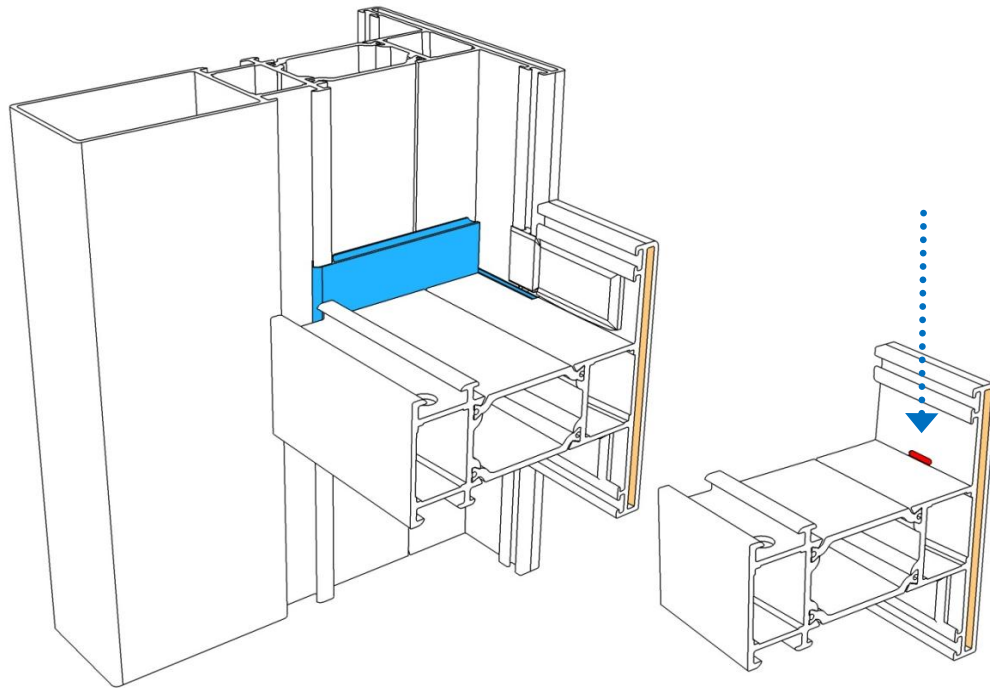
Any water that does penetrate is drained back to the outside through slots (red) which are connected to the exterior channel(orange).
